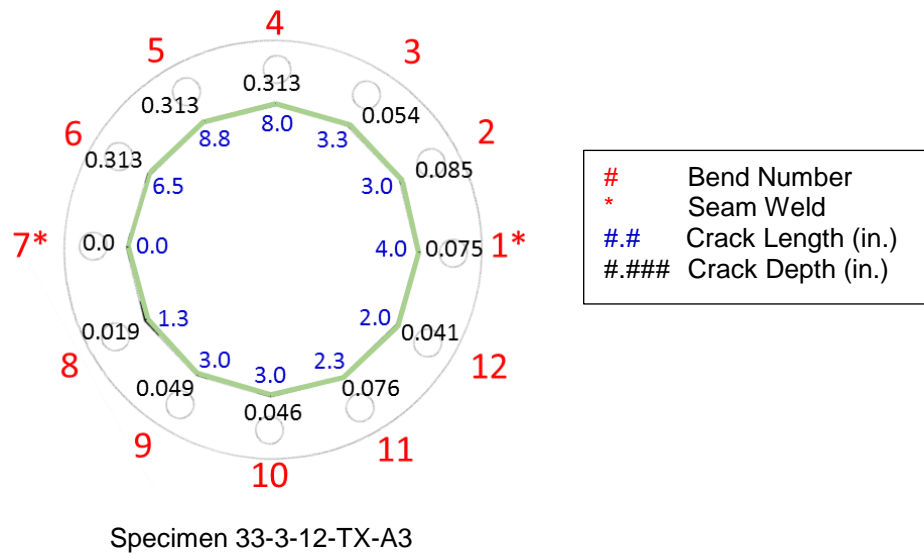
Specimen 33-3-12-TX-A3: Cracks after 3.8 Million Fatigue Cycles in Test 3 (Initial Cracks at the Beginning of Test 4)
